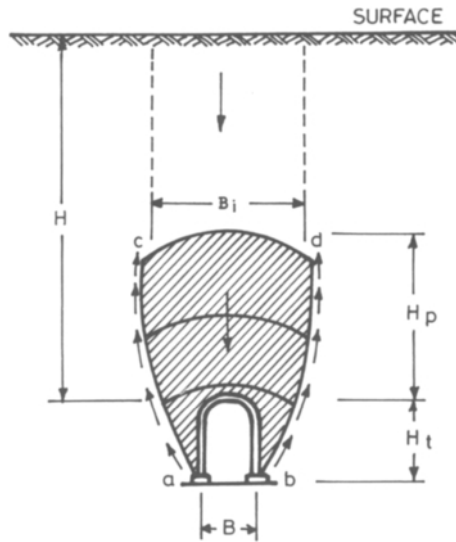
Terzaghi's (1946) rock-load concept in tunnels
